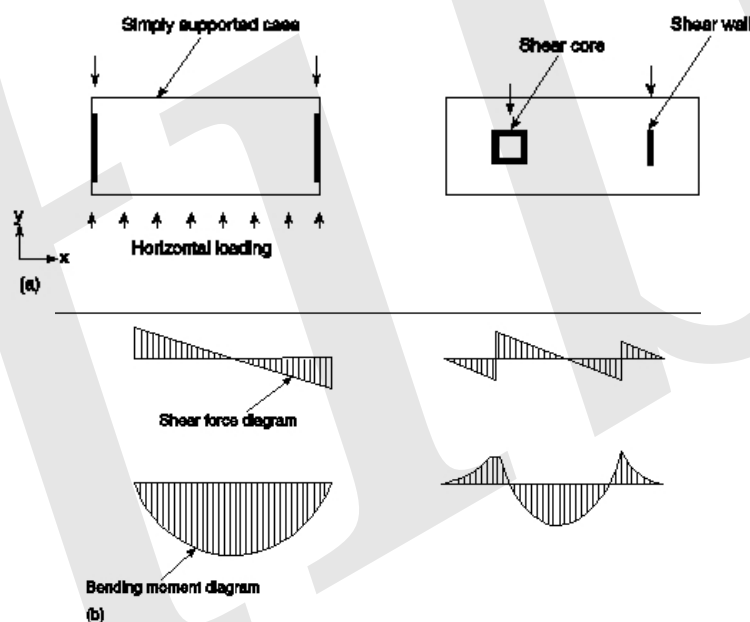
Examples of vertical bracing positions in simple floor diaphragm.
